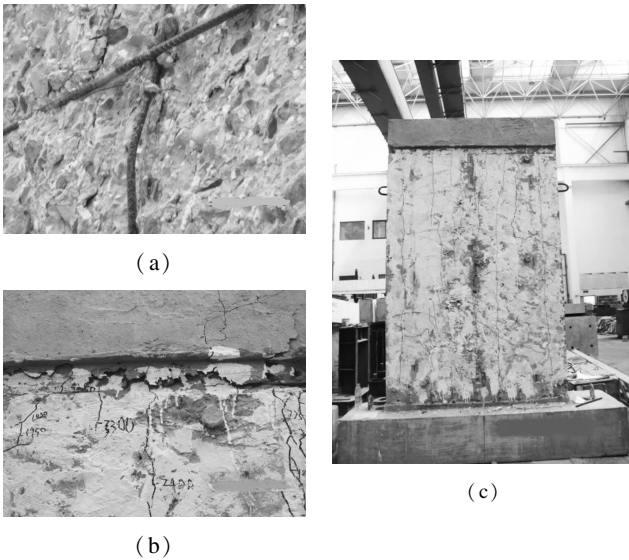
Failure characteristics of specimen DW2. (a) Concrete cover spalling; (b) Reinforcement buckling; (c) Crack pattern on the unexposed side
